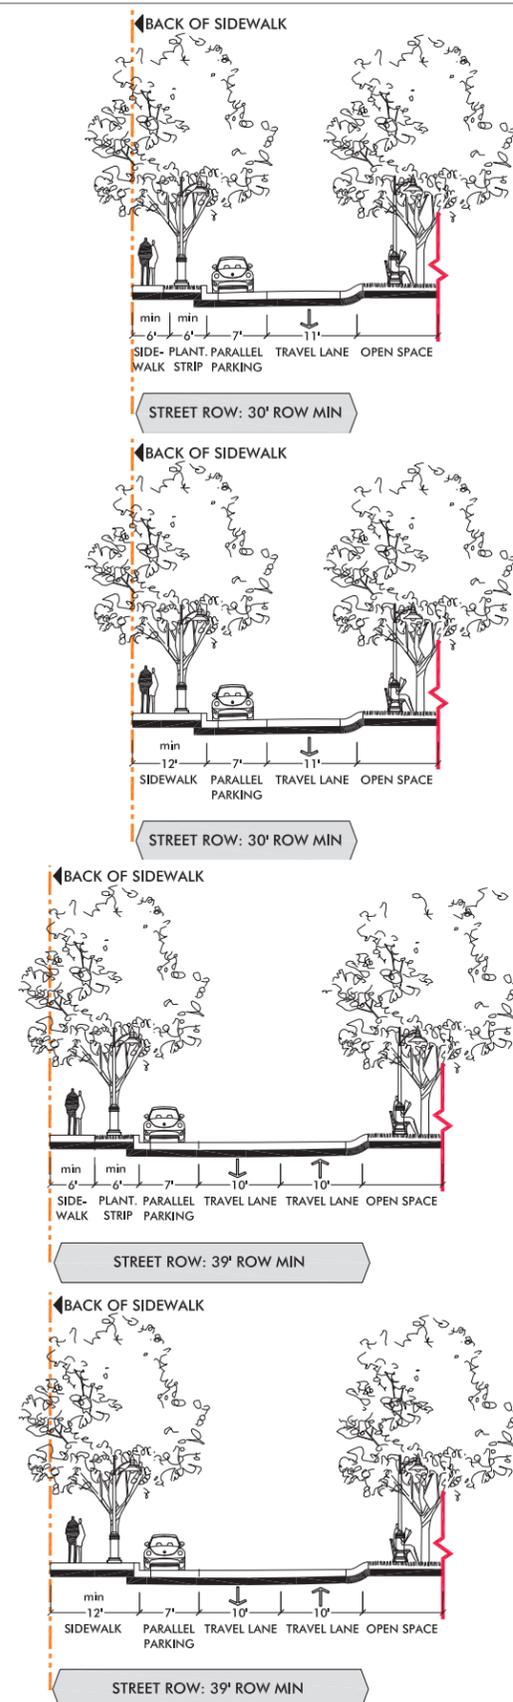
4) Public Open Space with Neighborhood Street
